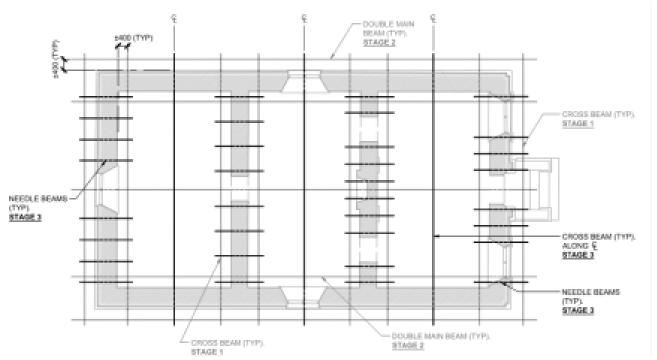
A plan view of the CRO with the Stage 1, 2, & Stage 3 Beam system
